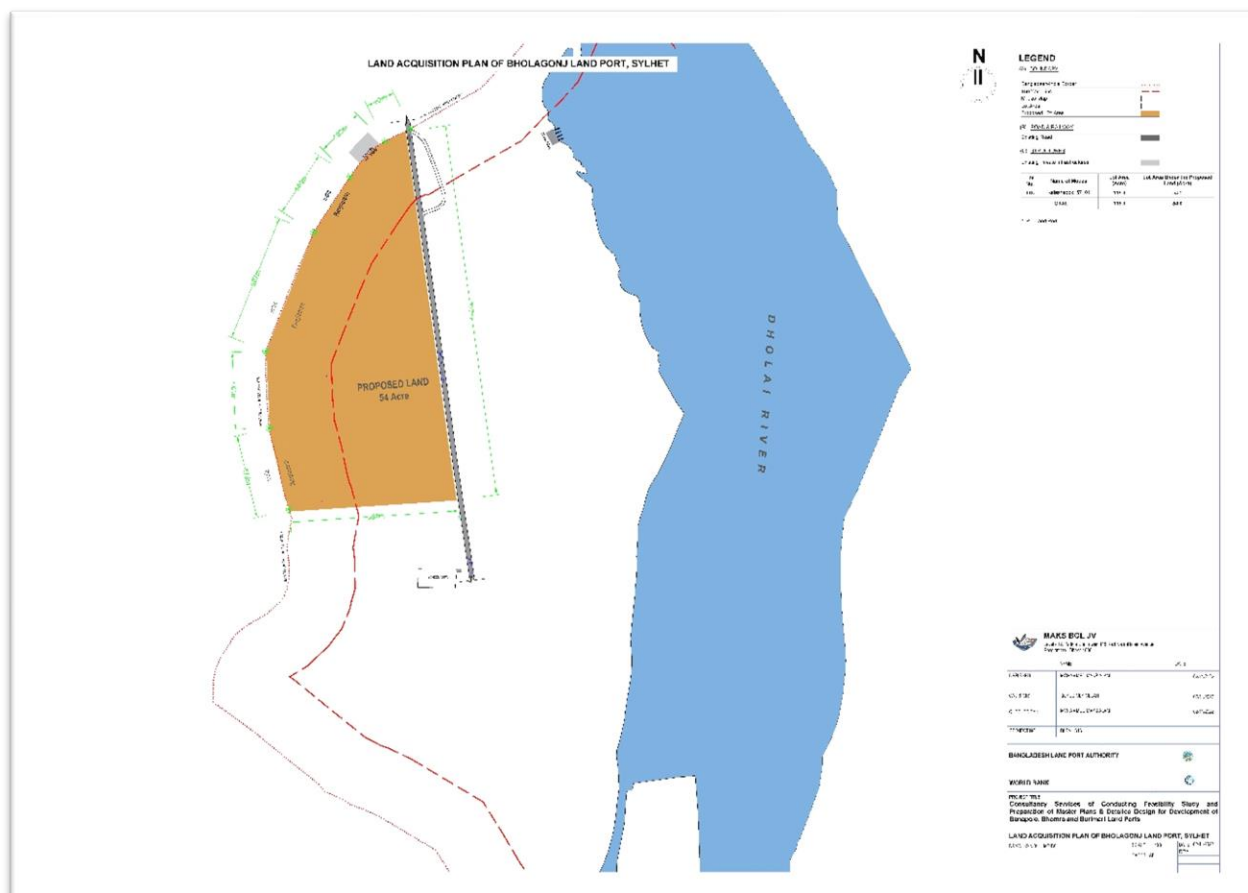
Proposed land acquisition plan for Bholaganj land port
